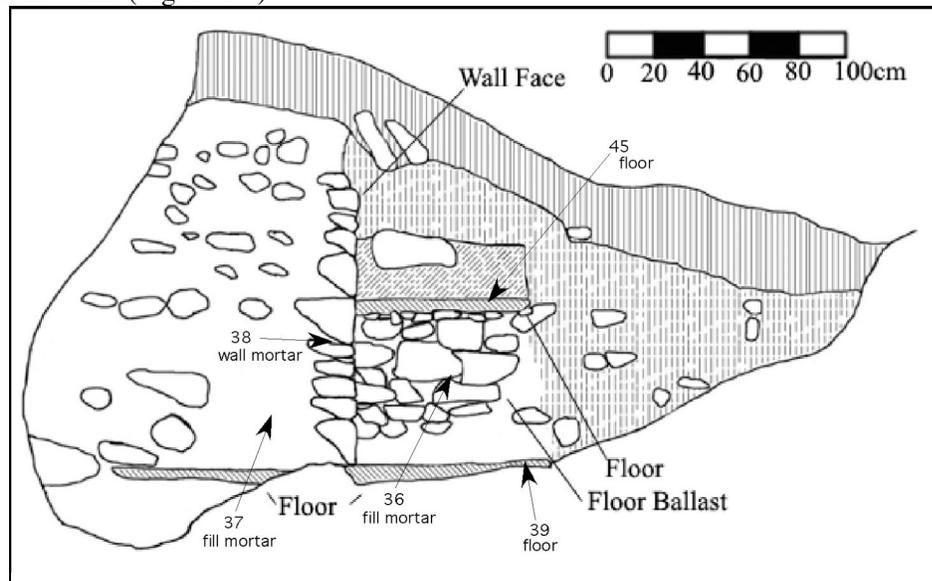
LT 12 Str. 1A-2b. South wall.
